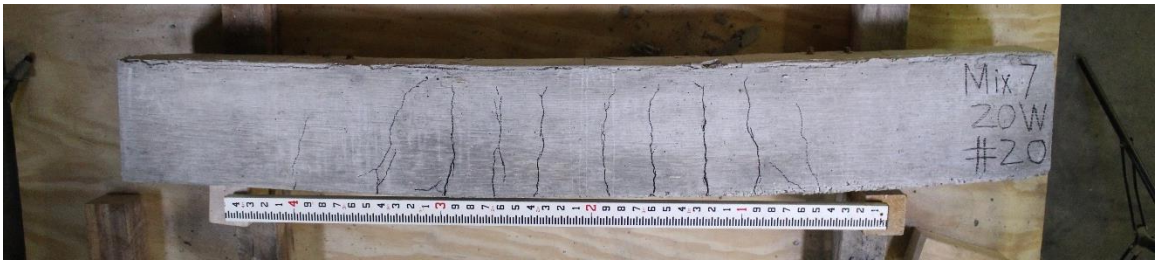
Mixture 7 (20W) beam #20: concrete beam side view.
